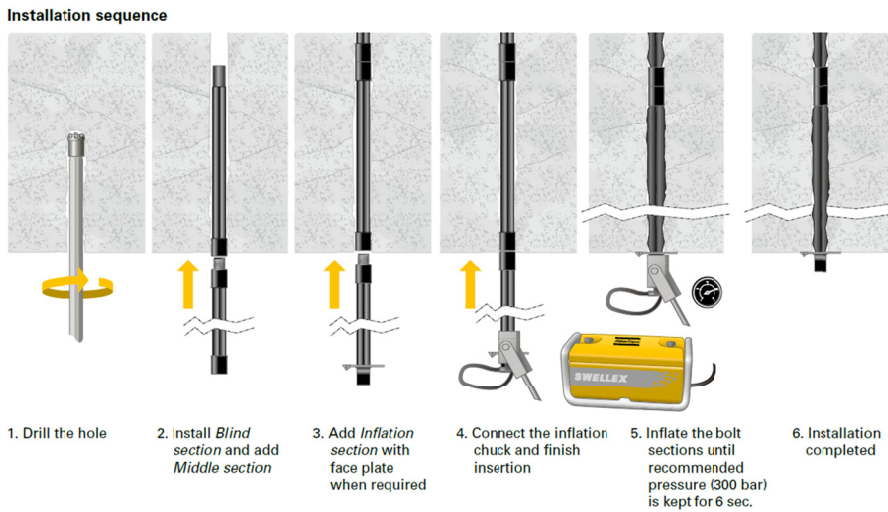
The six steps of Swellex rock bolts installation (*Swellex rock bolts...*, 2009)
